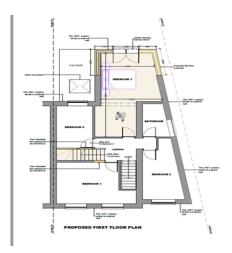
proposed first floor layout plan Figure 2 - proposed ground floor layout plan
